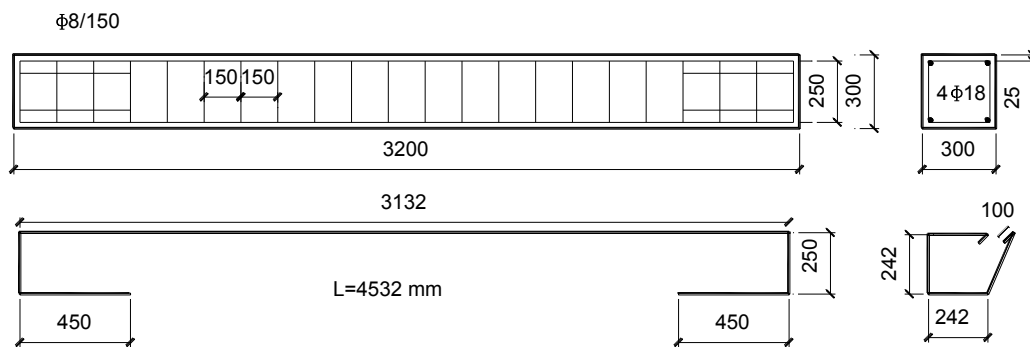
Geometry and reinforcement details of the specimens (all dimensions are in mm)
